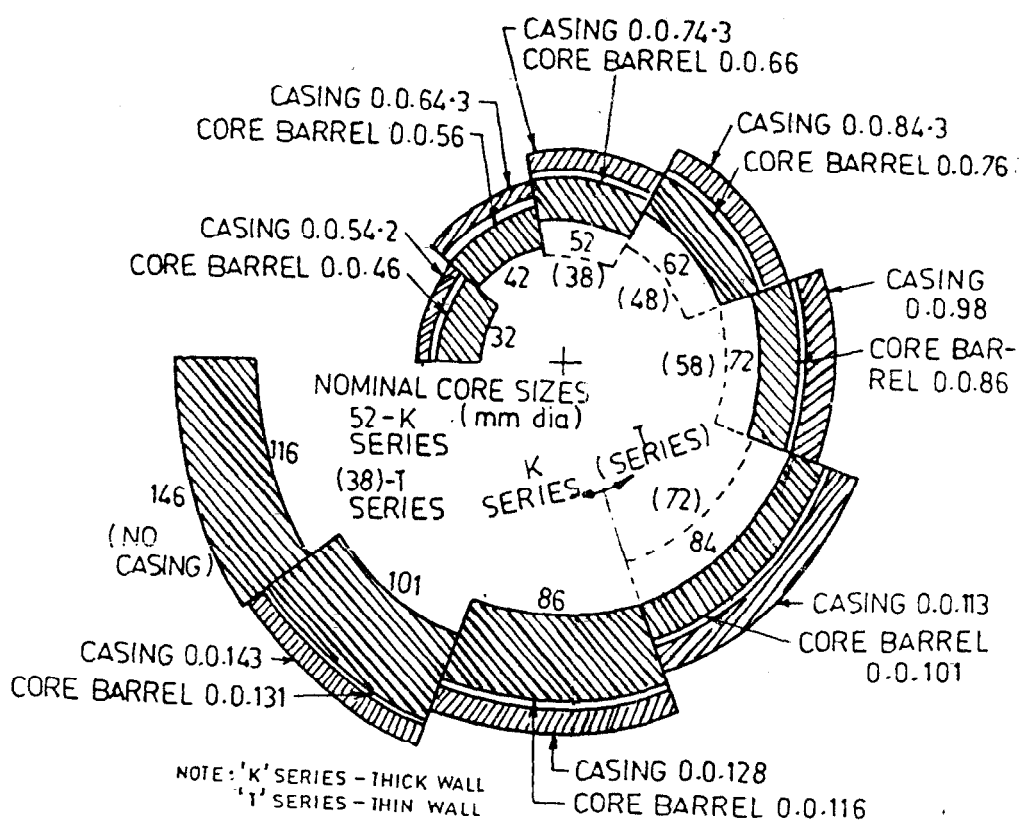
METRIC CORE BARREL AND CASING NESTING SIZES
